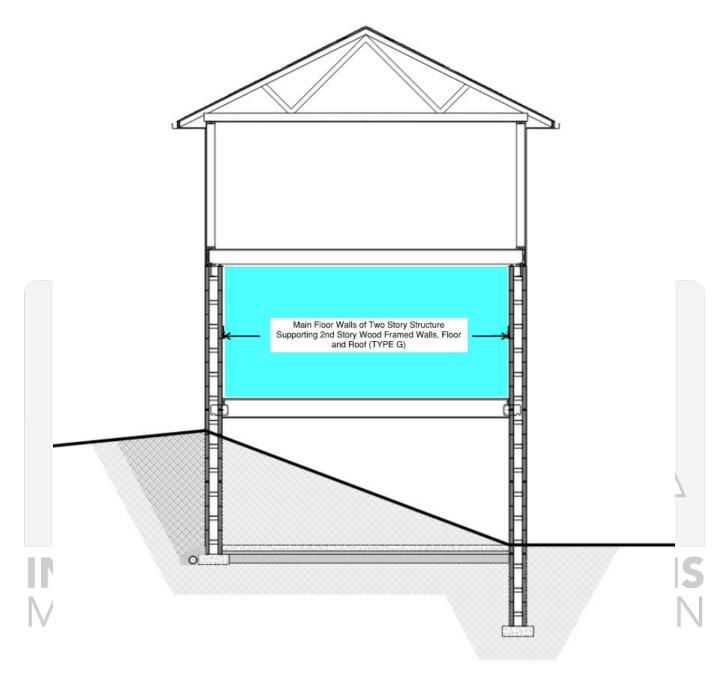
Wall Configurations in a Building with Walkout Basement
